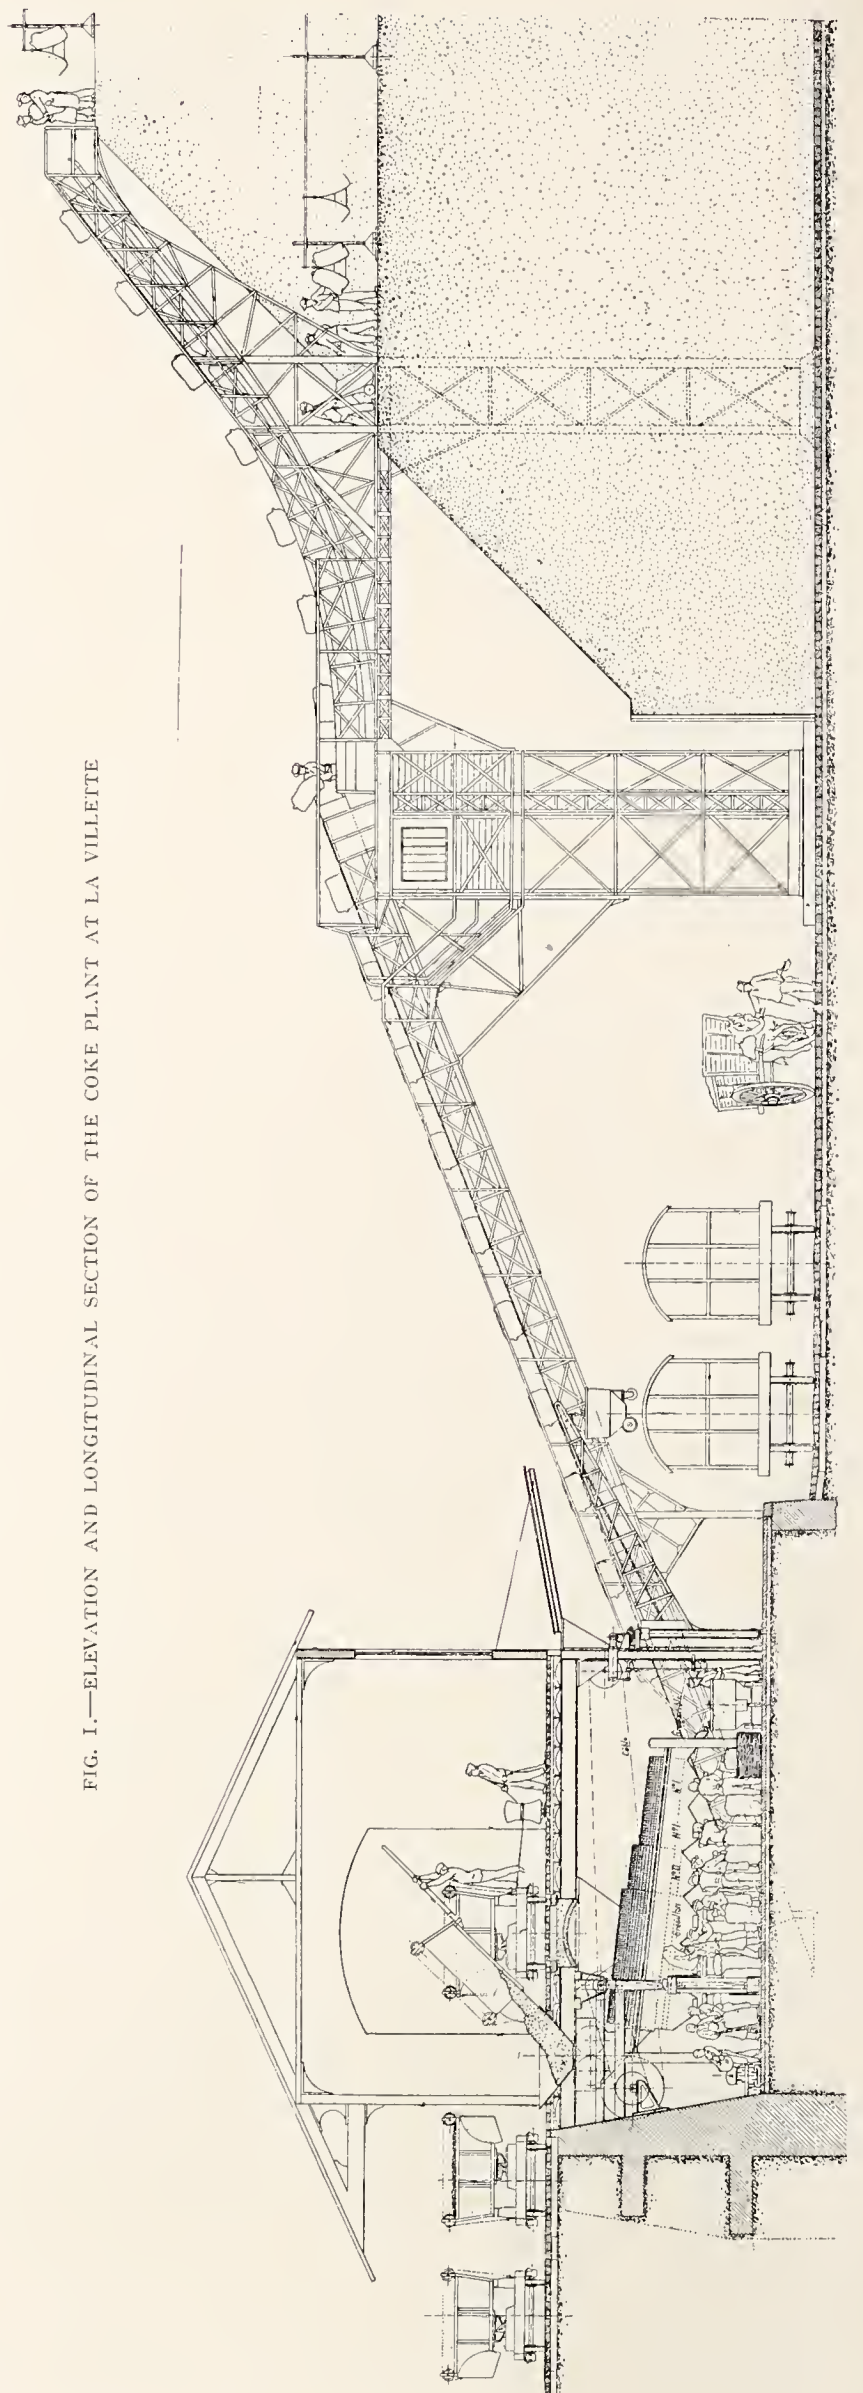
ELEVATION AND LONGITUDINAL SECTION OF THE COKE PLANT AT LA VILLETTE
